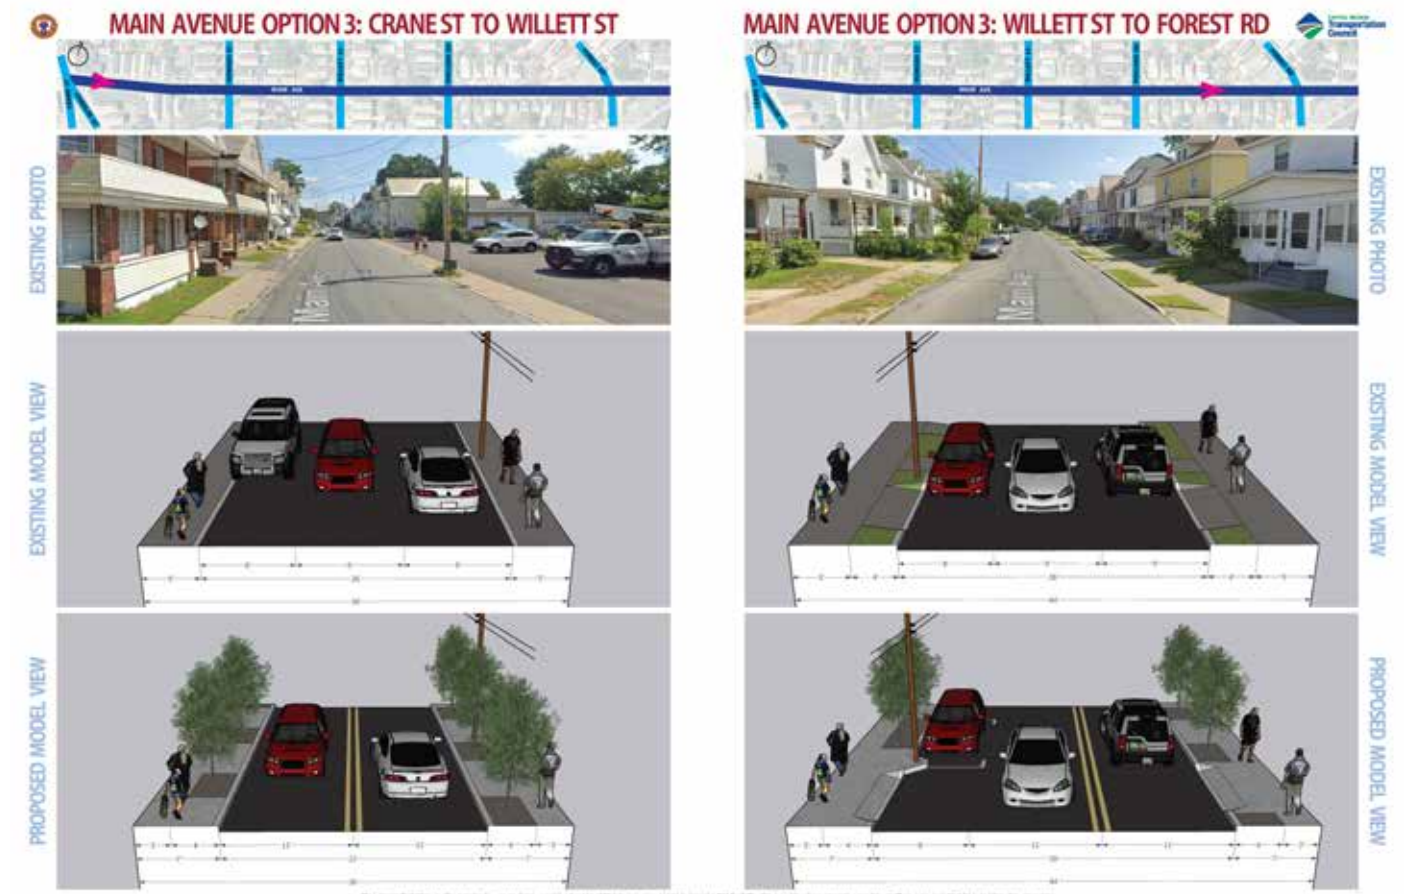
Main Avenue Concept 3 Cross-sections
